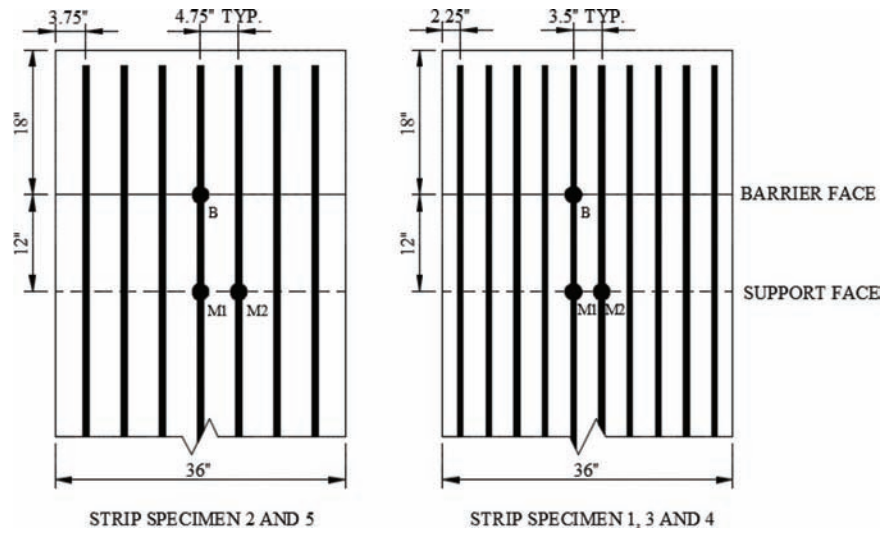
Full-scale strain gage instrumentation (plan view).
